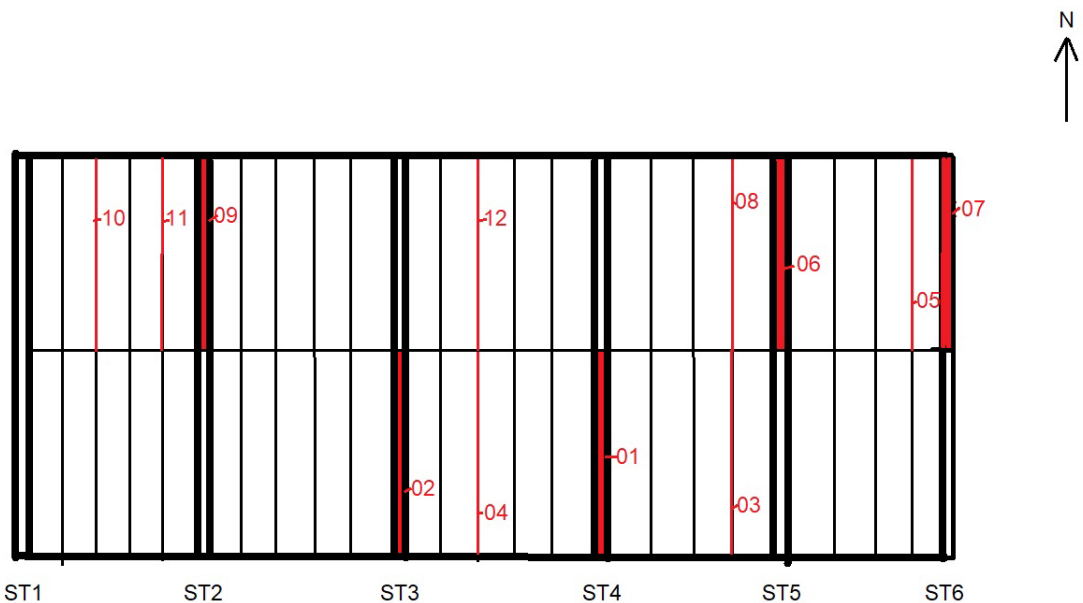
Sketch plan of the roof (not to scale) indicating the rafters sampled (red). Note there are four common rafters in the three western bays, and only three common rafters in the two eastern bays
